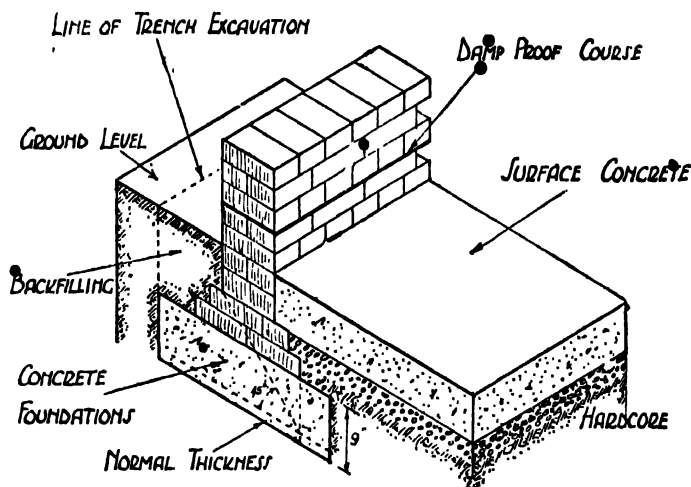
CONCRETE FOUNDATIONS TO ONE BRICK WALL
